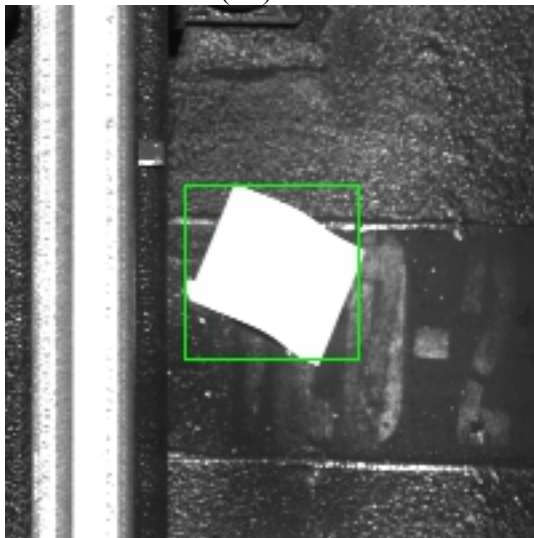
Inspected defects in the elevated section after rain. Down direction left rail (III).
